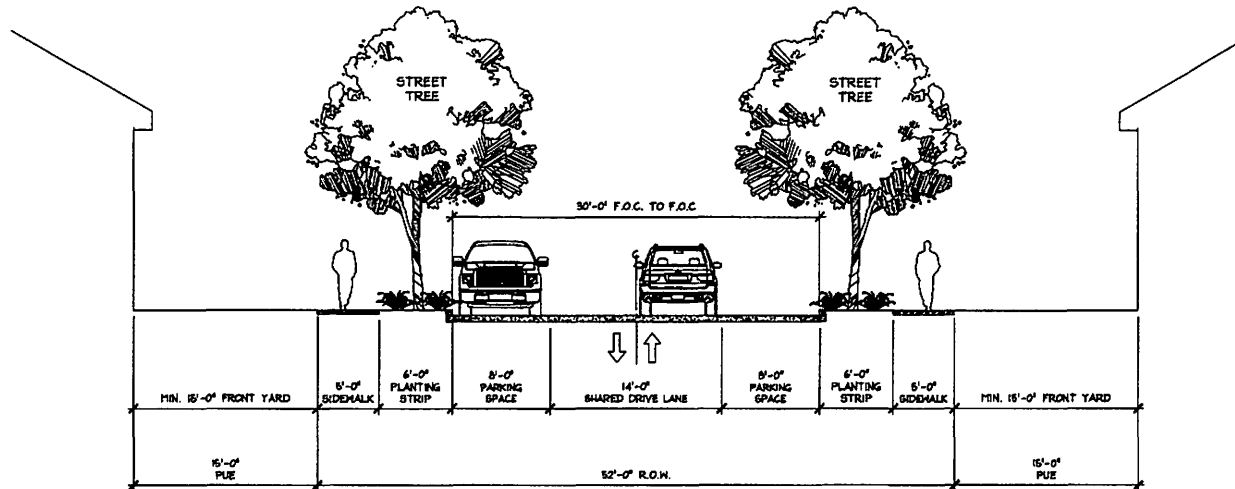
EXHIBIT F - PD STREET STANDARDS - TABLE
